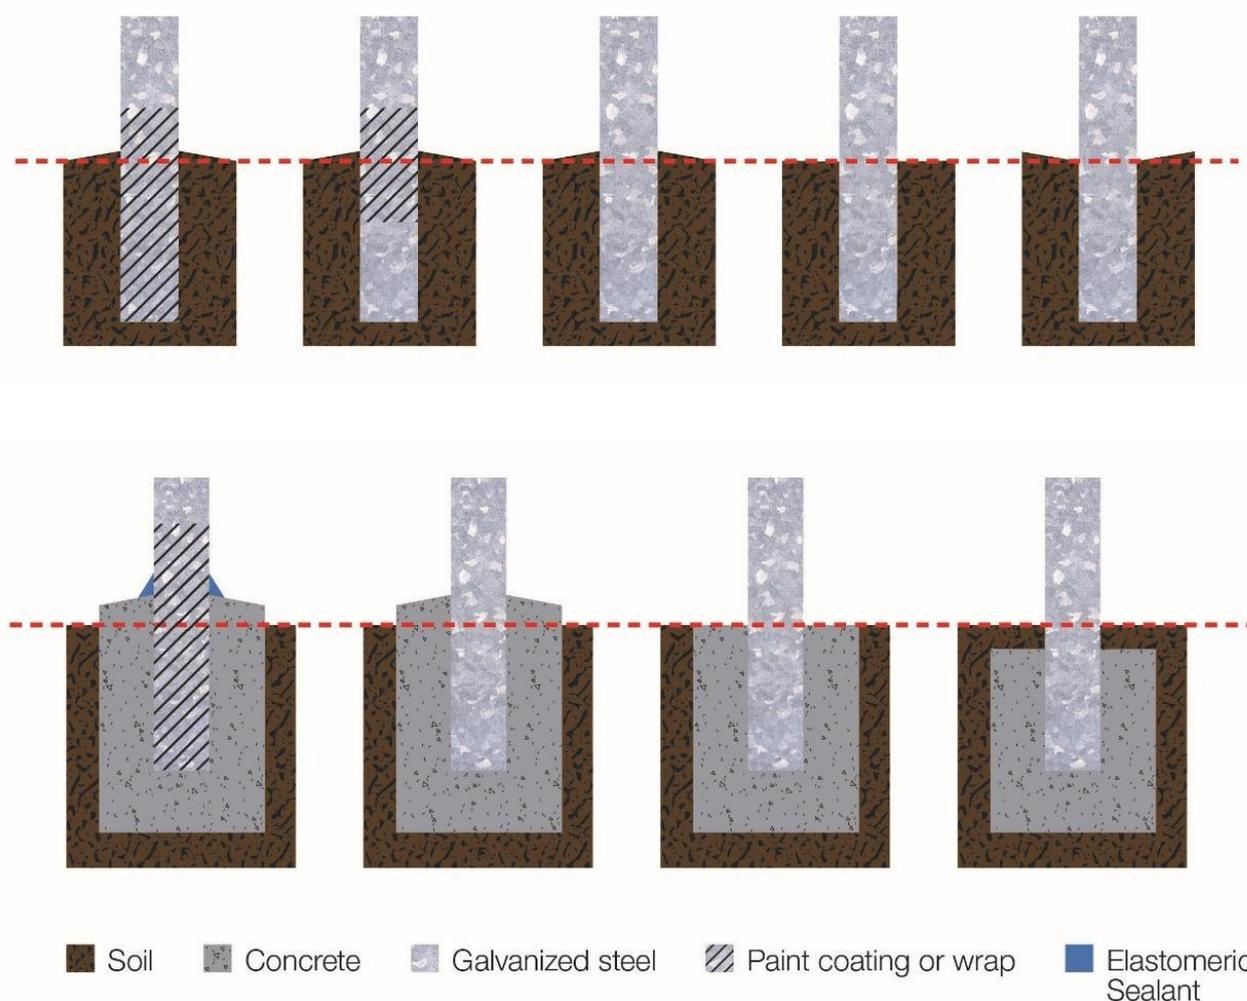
Showing the best design (left) to worst design (right) for galvanized steel embedded in soil and concrete. See also Figure 11 for more details on the best design practice for posts embedded in concrete in a corrosive location.
